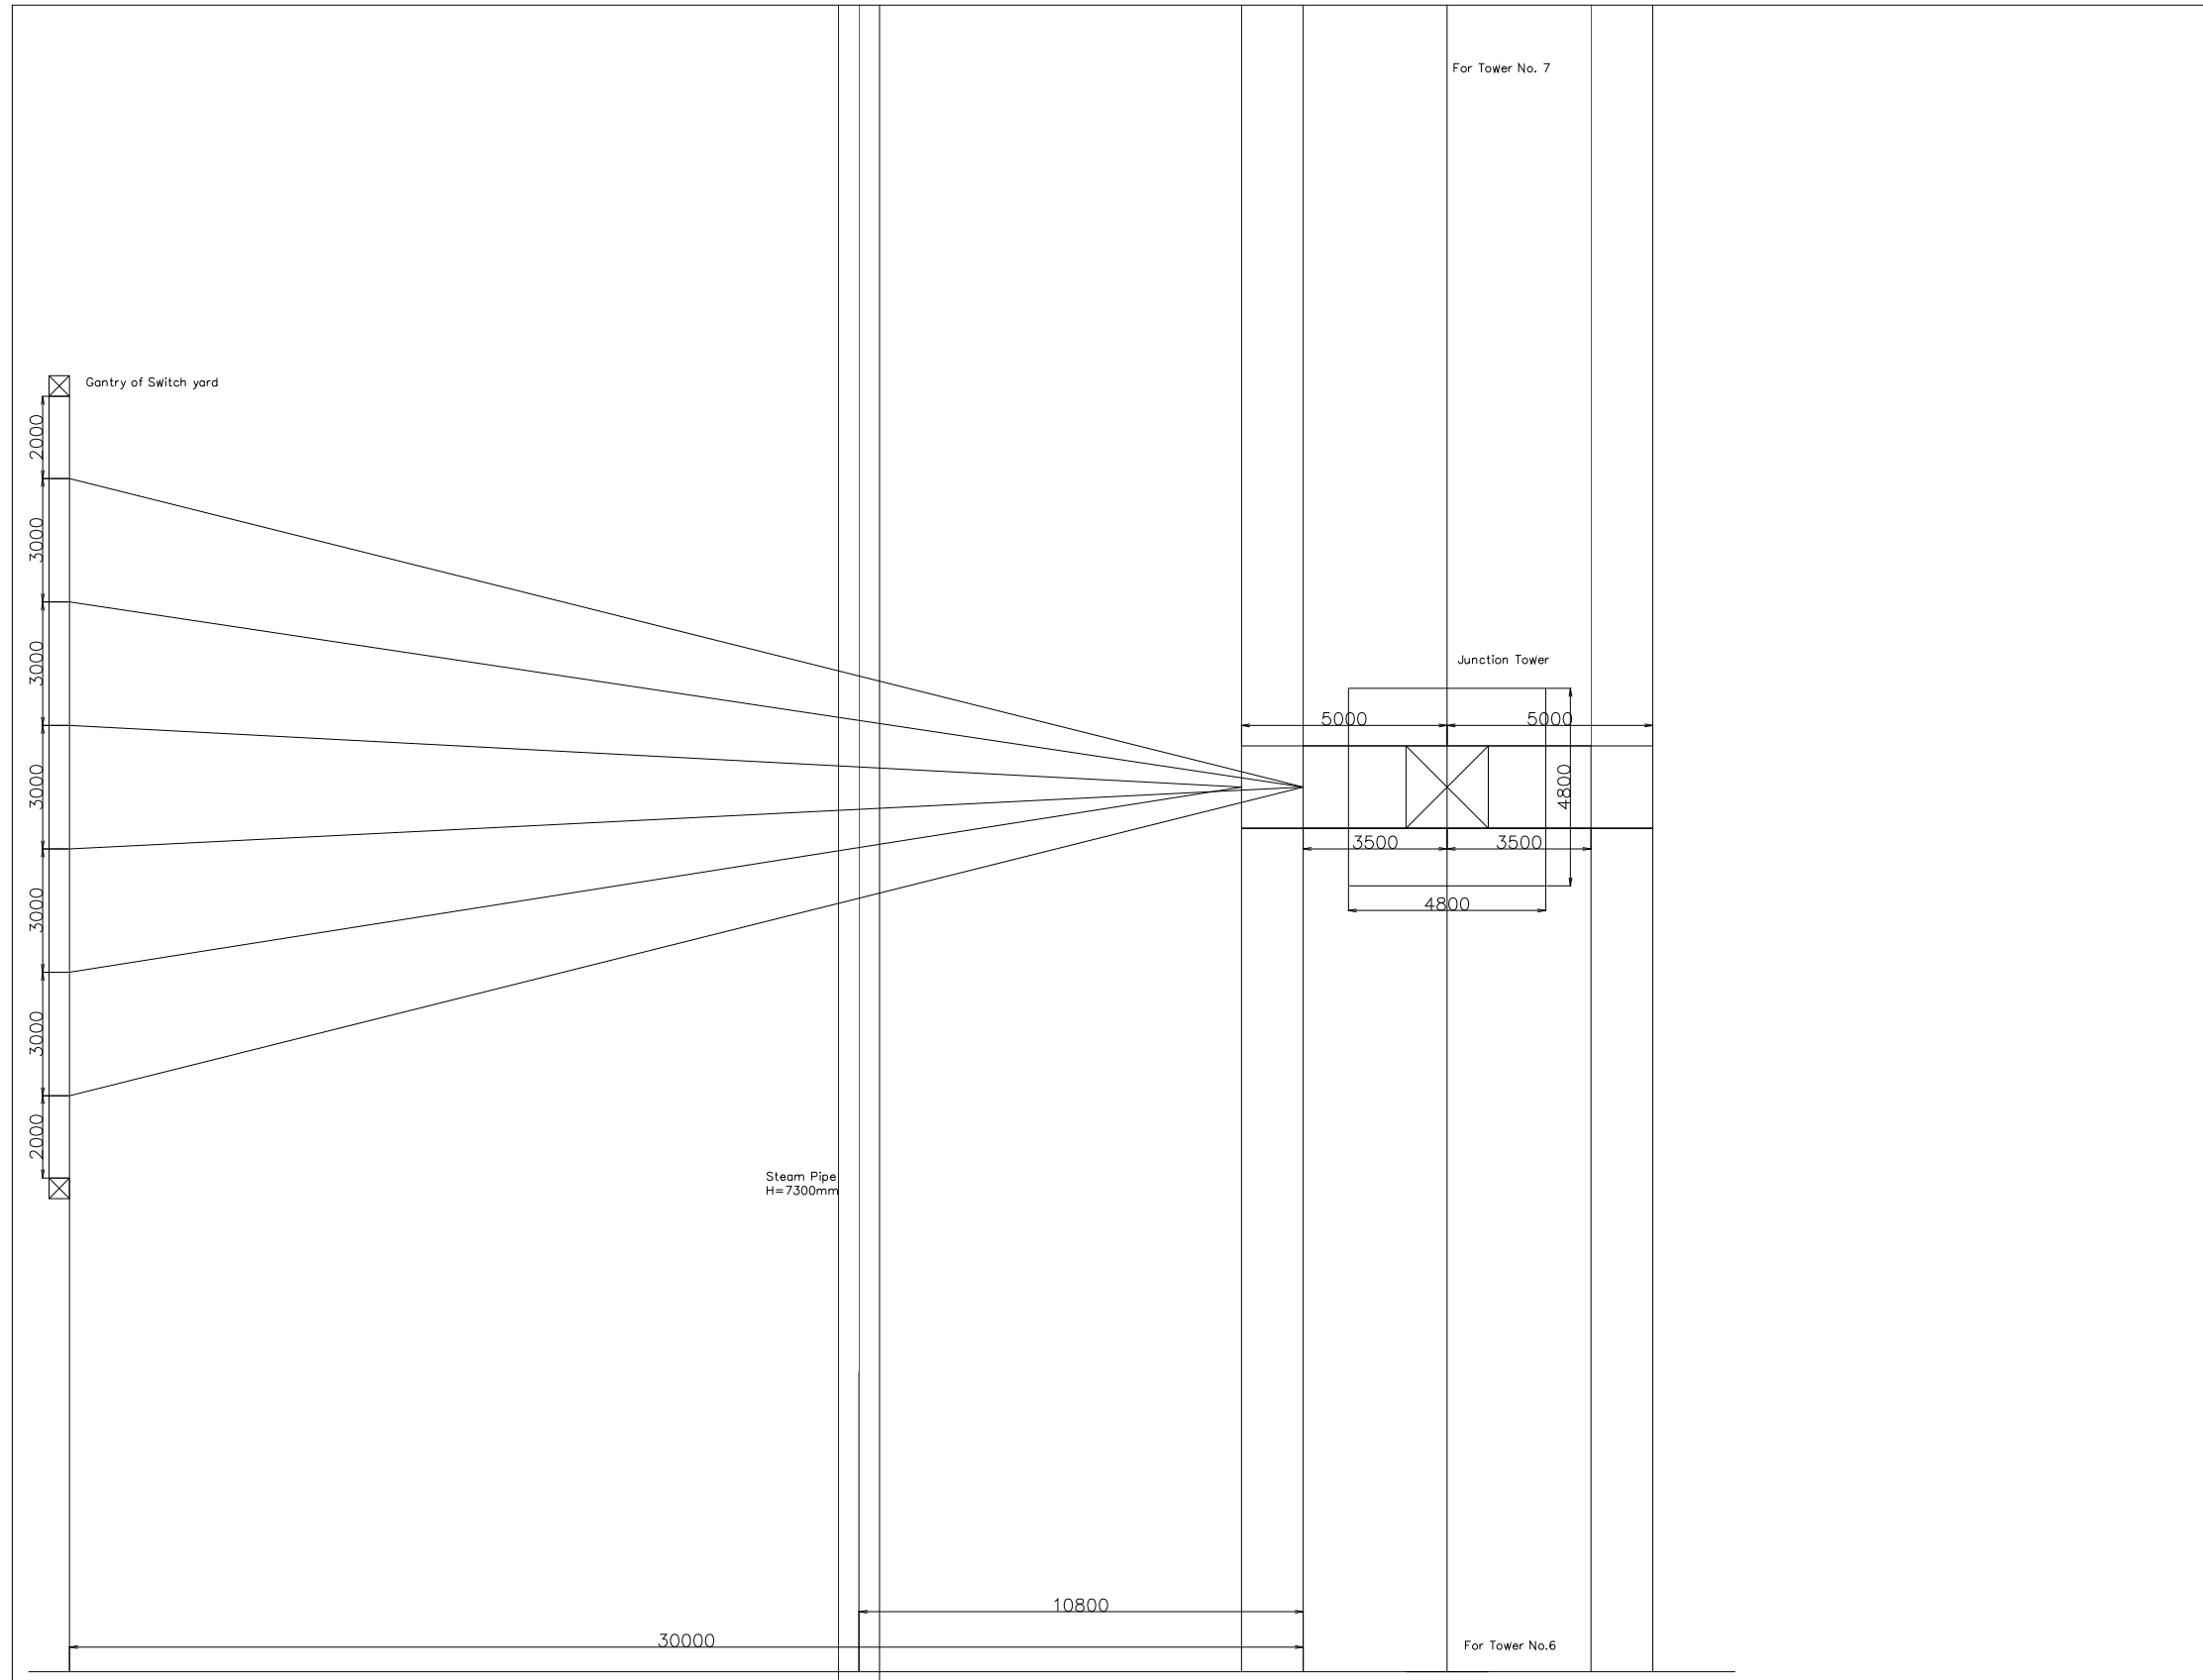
Ground Plan between Junction Tower and New Switching Station Gantry
